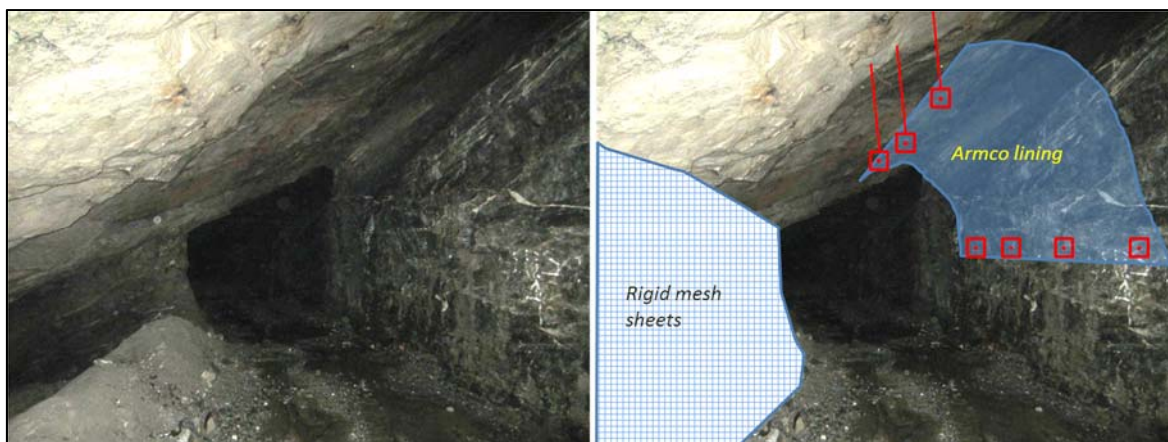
Significant hanging wall failure from stope 510-27 where rock slabs have fallen into the drive (source: SRK ES, 2016)
